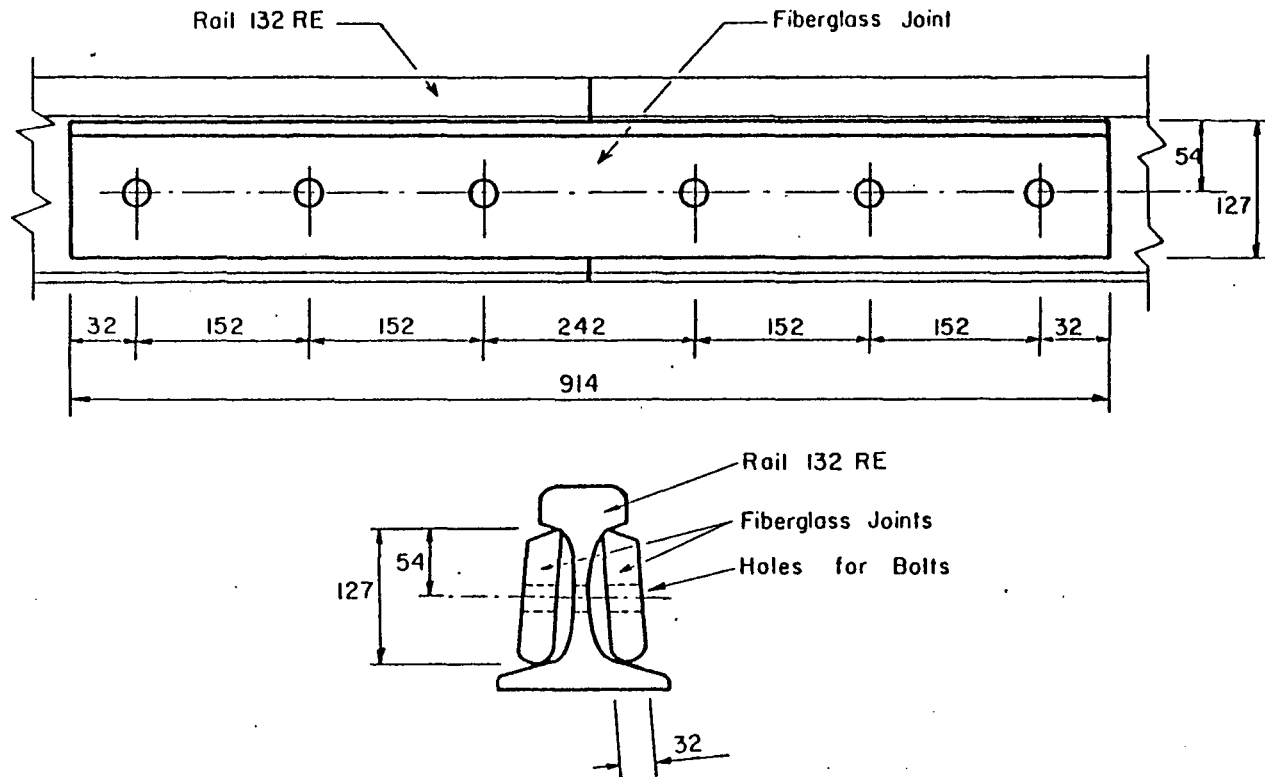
Fiberglass Strips used to Create the Electric Insulation Joint on the Rails
